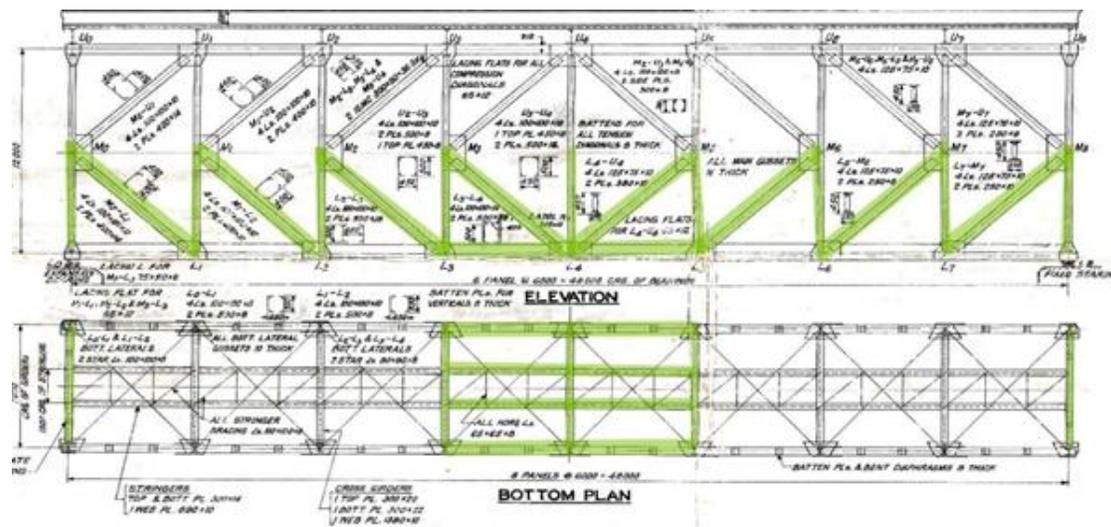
Godavari Rail-cum-Road Bridge and selected 48m span
